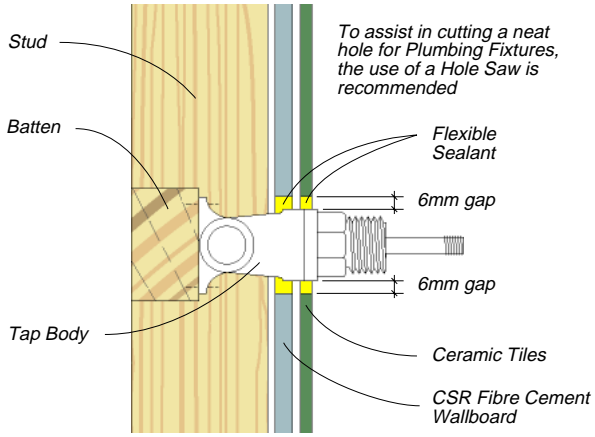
TYPICAL HAND BASIN INSTALLATION DETAIL.
